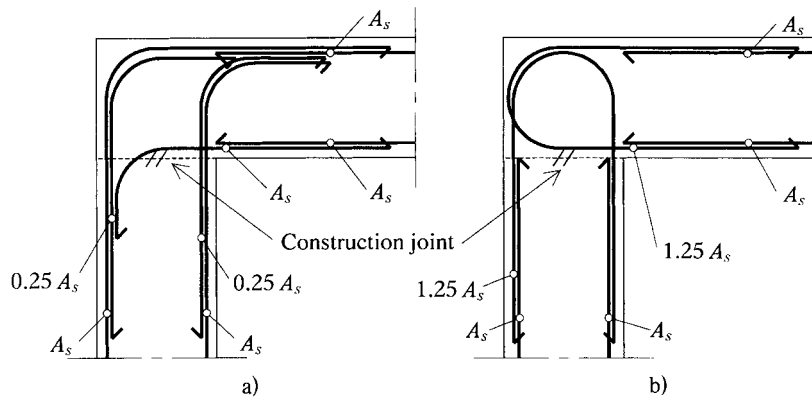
Detailing of Reinforcement According to: (a) Conventional Method; (b) New Alternative. Extra 25% of Reinforcement at Corner Area Is Only Necessary If There Is Construction Joint Present
